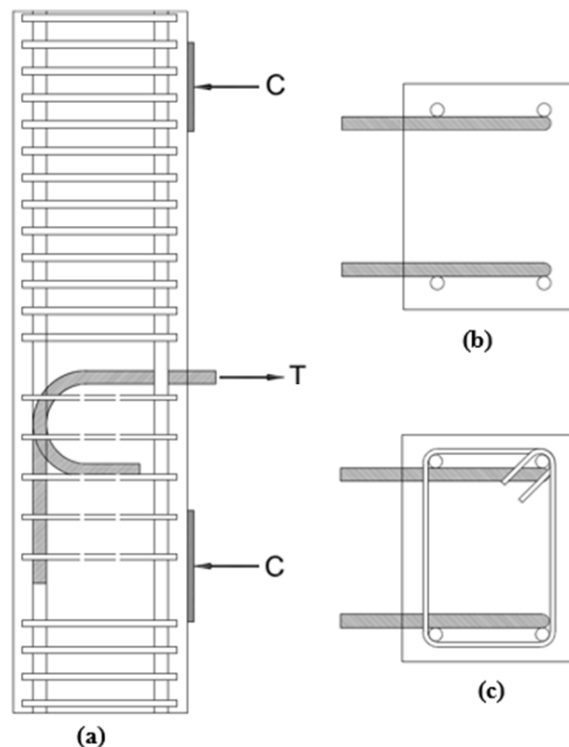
Schematic of specimens (a) side view of specimen (b) cross-section of specimen with hooks inside column core and without confining transverse reinforcement (c) cross-section of specimen with hooks inside column core and with transverse reinforcement
